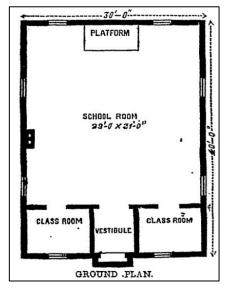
Prospective one-room schoolhouse floorplan (*The Canada Farmer*, Vol. 3, no. 12, p.189)
